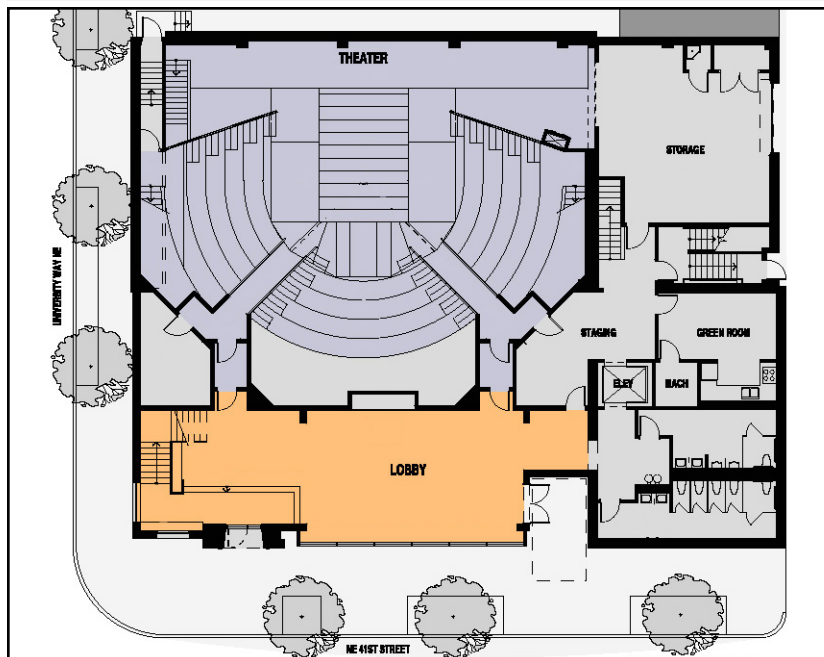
The 2009 floor plan of the Playhouse Theater showing the new stage configuration. Credit: LMN Architects, courtesy UW CPD.
